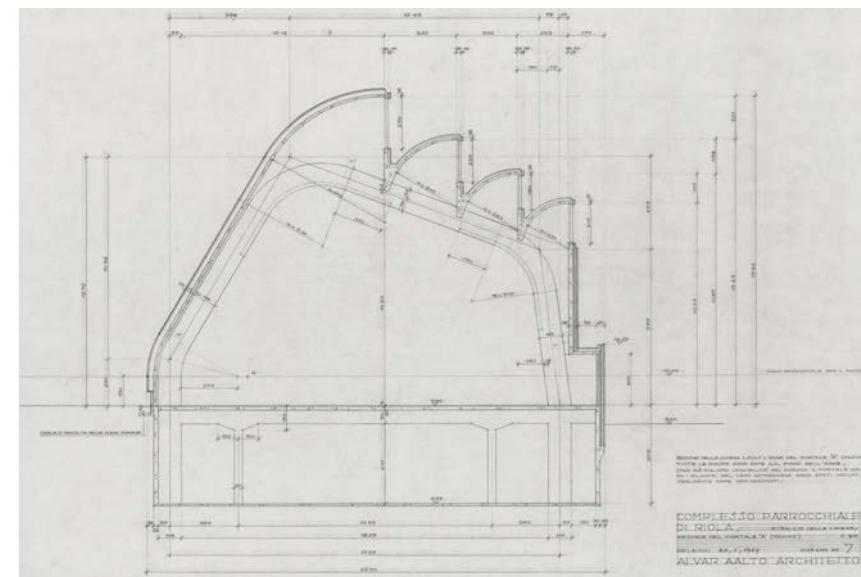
Section of the Hall. (Alvar Aalto Foundation: <https://bit.ly/2xvo4pp>)
